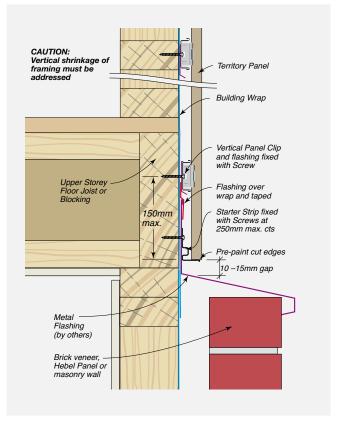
Second Storey Junction with Masonry, Brick Veneer or Hebel Panels – In-line Framing
